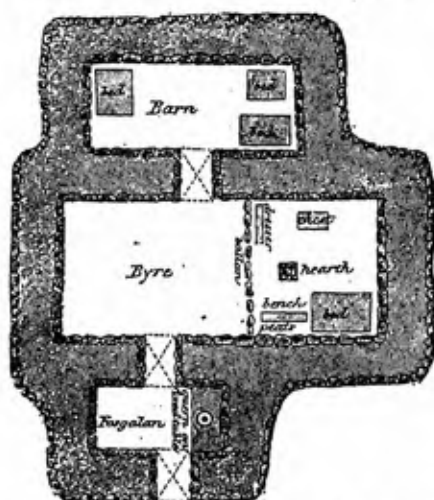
Ground-plan or diagram showing arrangement of rooms, furniture, etc., in one of the Black Houses of The Lewis.
